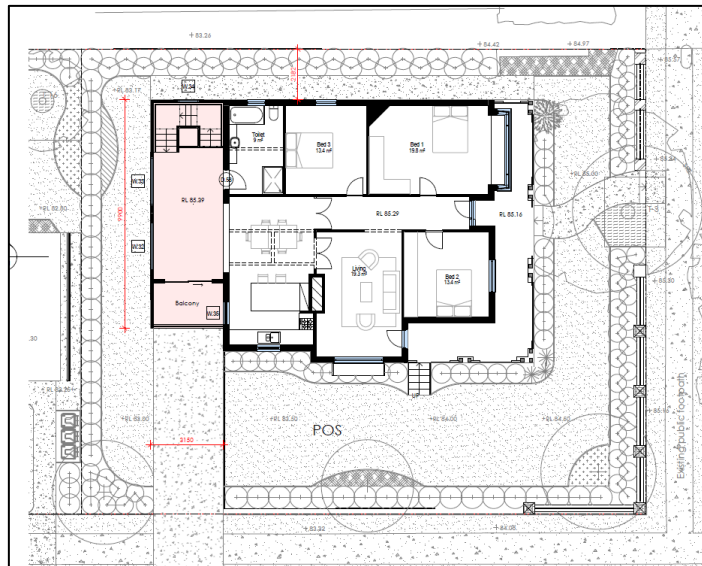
Proposed ground floor plan of existing dwelling (heritage item)
